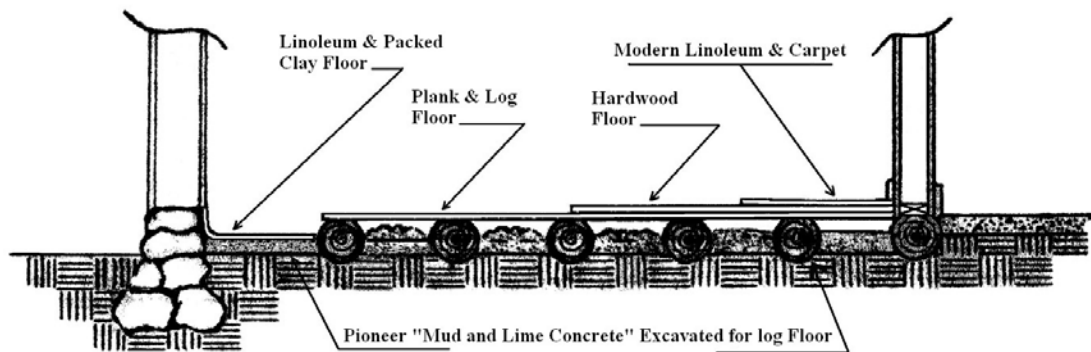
Detail drawing, illustrating through time, the four living floors found in room block #4. From left to right: The mud and lime concrete and linoleum floor; the log and plank floor; the hardwood floor; the modern carpet and linoleum floor.
